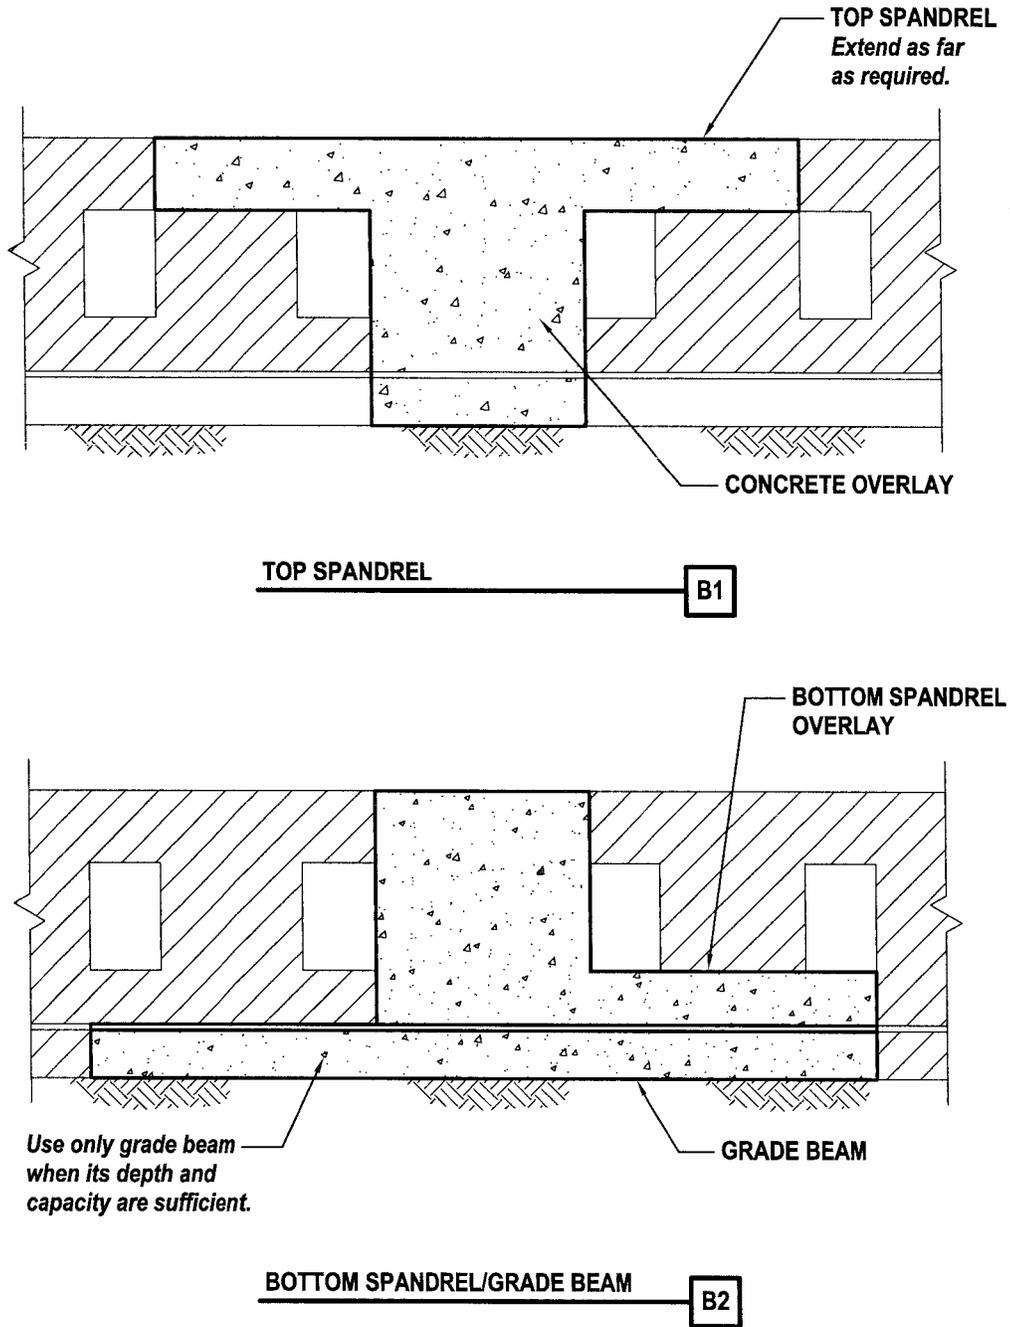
B: Alternatives to Distribute Overturning Loads in Concrete Overlay
